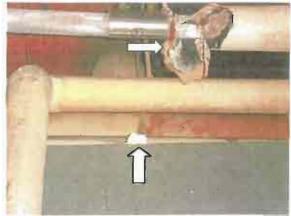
View of damaged pipe in boiler room (note ACM resting on ducting)
